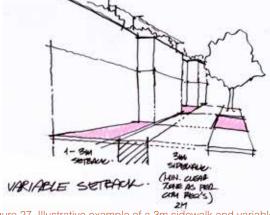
Illustrative example of a 3m sidewalk and variable building setback
